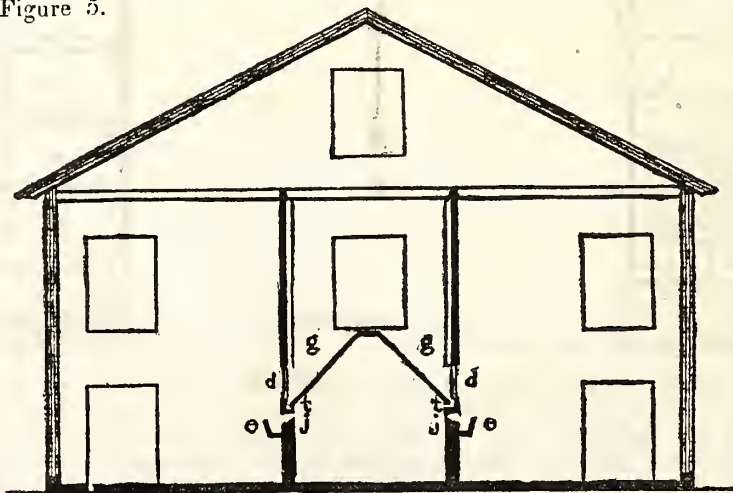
, shews a cross-section through horse stables; a, a, interior of feed room which is ceiled with plank, in a triangular form; g, g, receptacle for hay, which with the perpendicular slats d, d, forms the hay rack; t, t, boxes to receive the hay seed and dust, latticed over the top and opening into feed room; e, e, mangers; j, j, spaces to pass feed through to mangers. The advantages of this form of a hay rack are ob-
